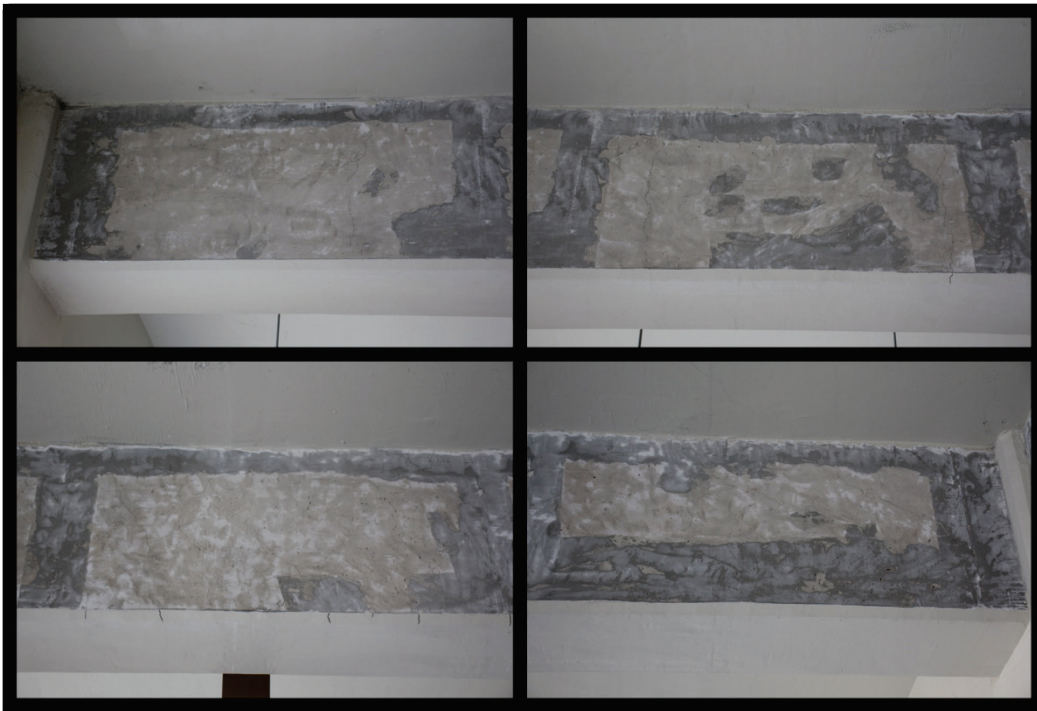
Cracks in bare concrete of girder along column line E in Parking Garage 1.
